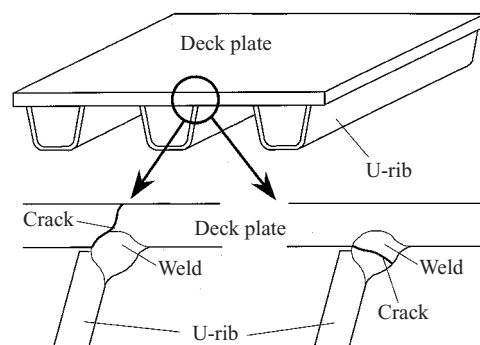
Schematic diagram of fatigue crack in weld between deck plate and U-rib
